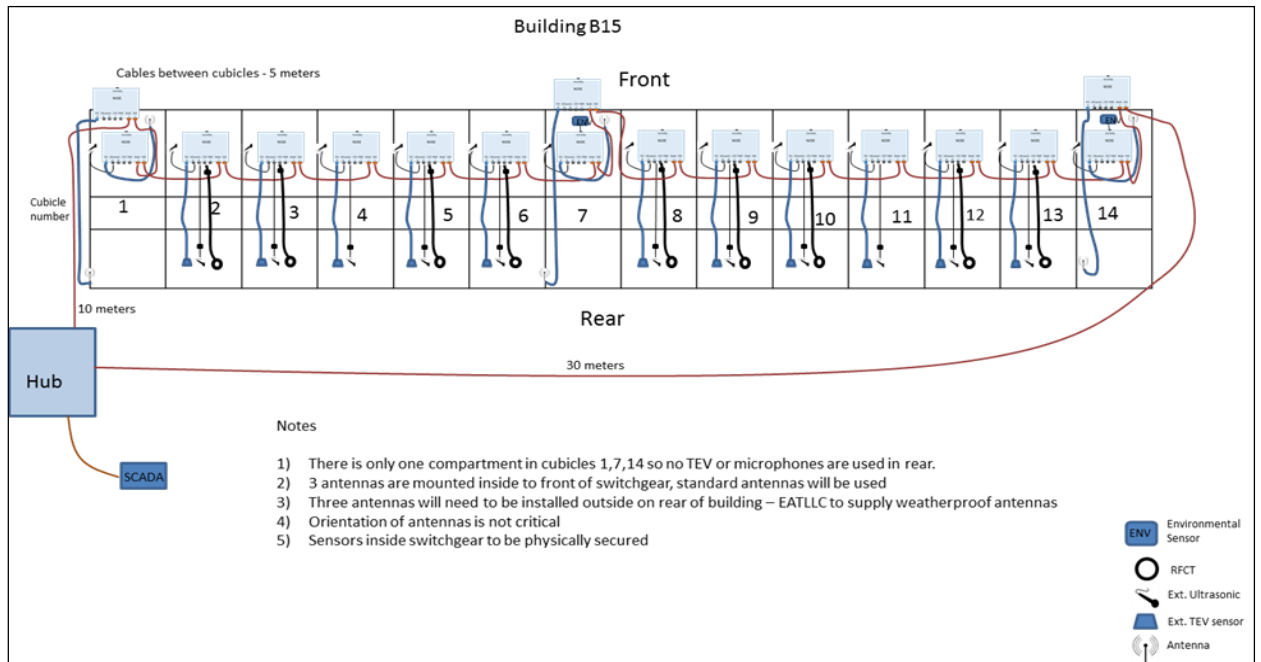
PD Monitoring System - Outdoor Switchgear Layout
